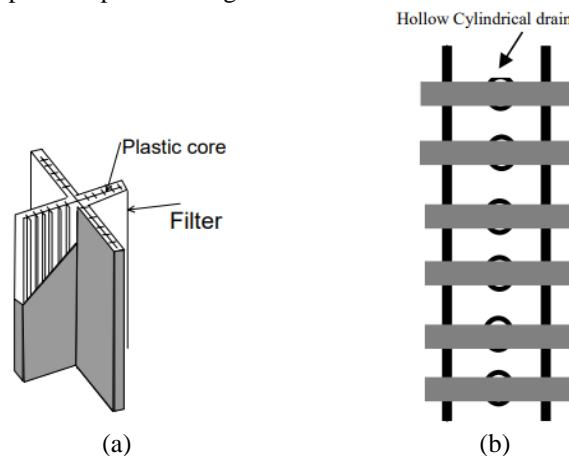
(a) Cross-shape PVD, (b) Hollow cylindrical drain [47]
